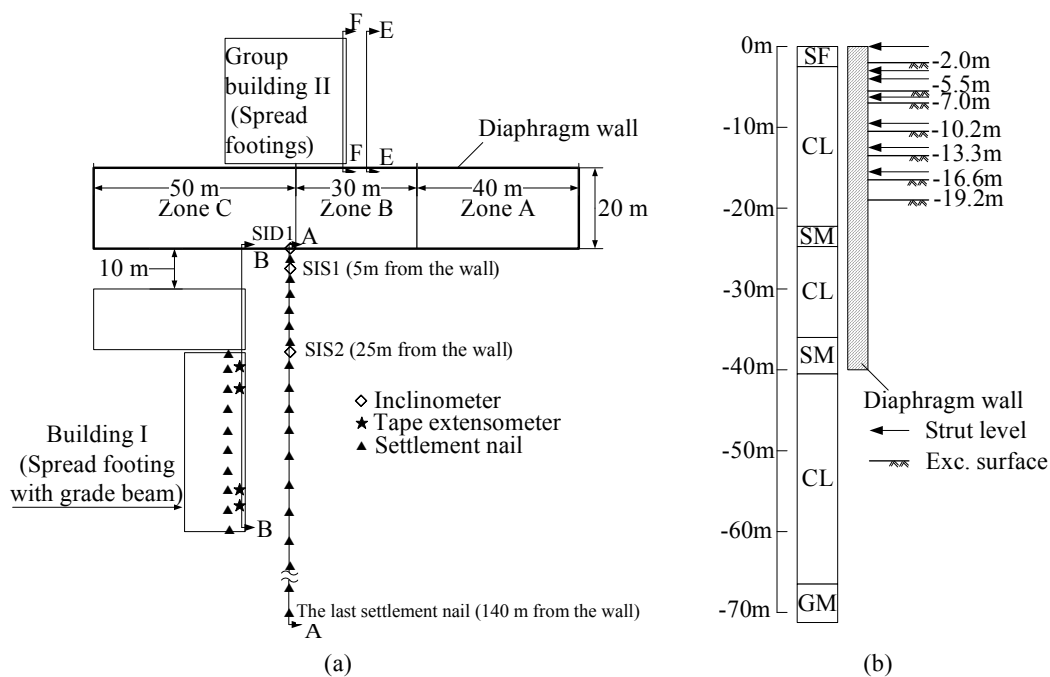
Excavation profile: (a) Instrumentation plan; (b) Simplified excavation section
